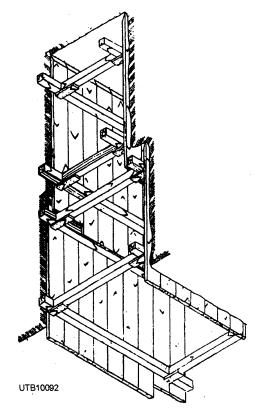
Method of bracing when two lengths of sheetpiling are used.
